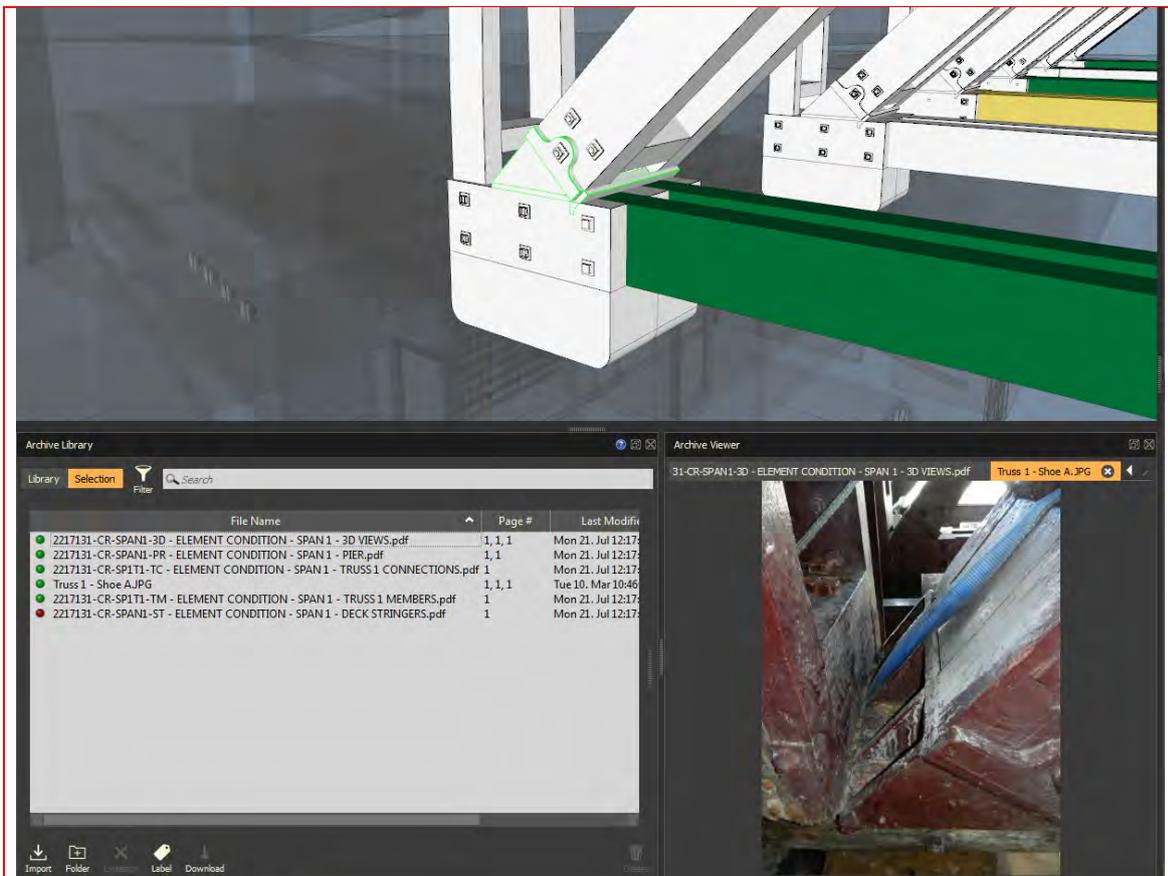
Pymont Bridge truss shoe inspection (M-Six, 2015)
